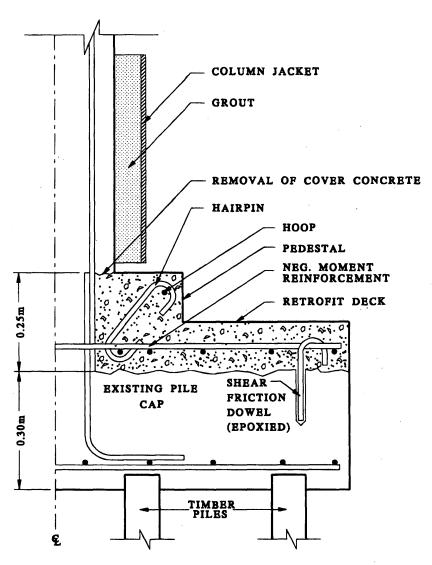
Retrofit scheme for Specimen No. 2 (1 m = 3.3 ft).
